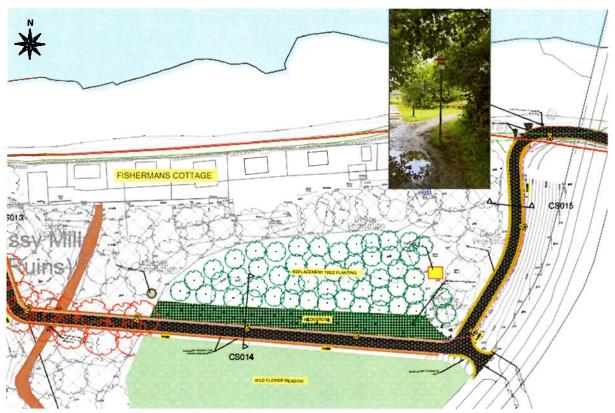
Proposed section to the south of the existing Fisherman Cottages (CH1040-CH1330)
